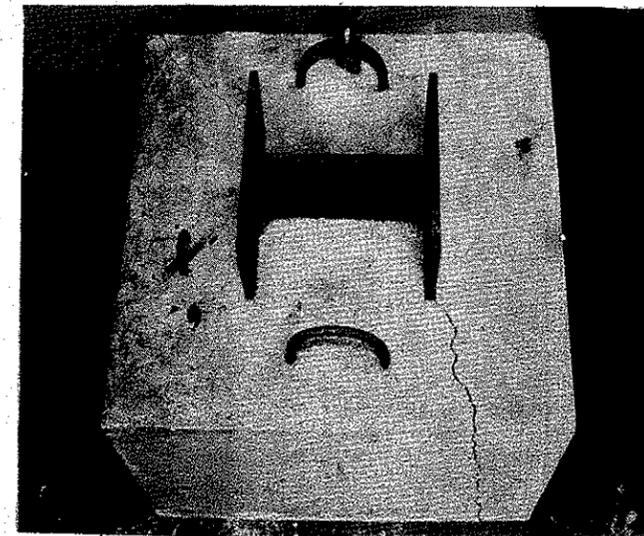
FAILURE IN CONCRETE BLOCK ON SPECIMEN A-6 WITH 10" X 10" H-PILE.
